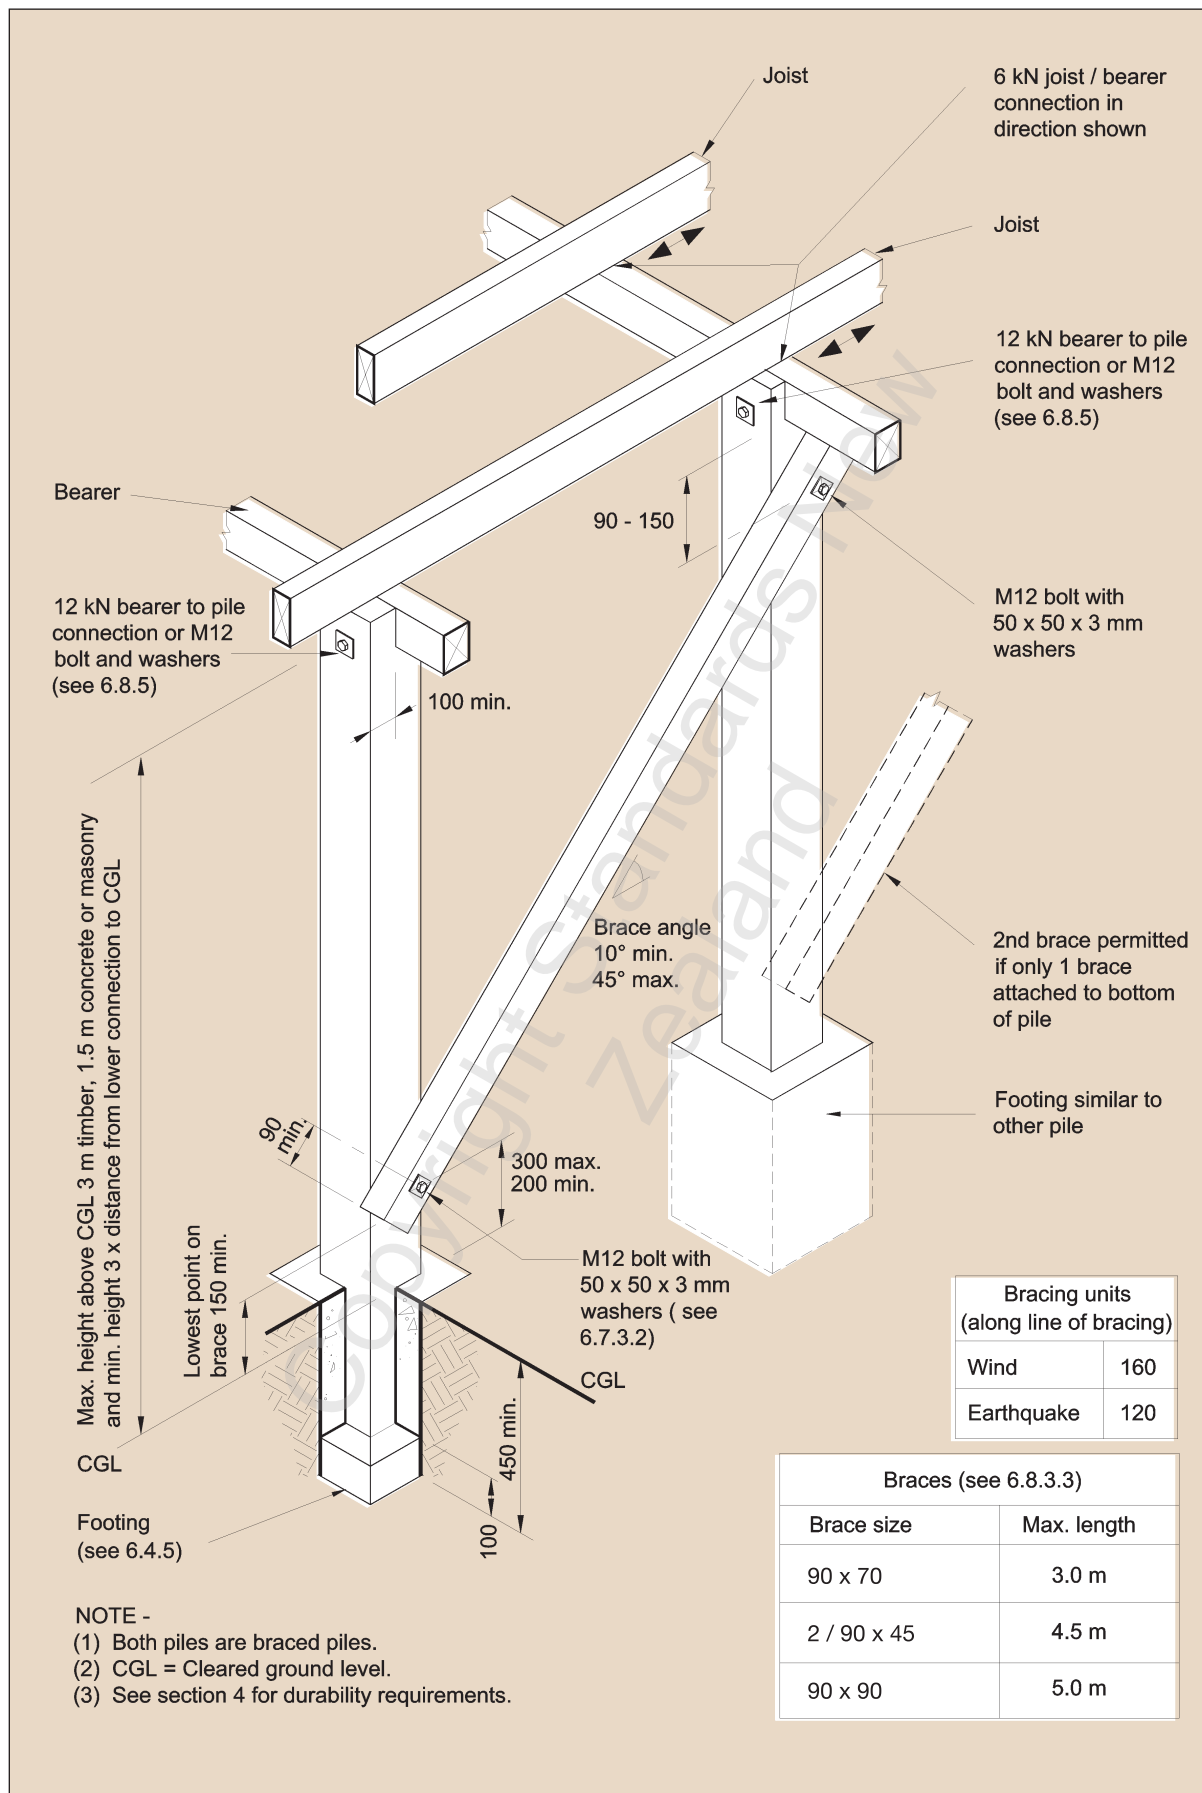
Braced pile system – Brace connected to pile (see 6.8)
